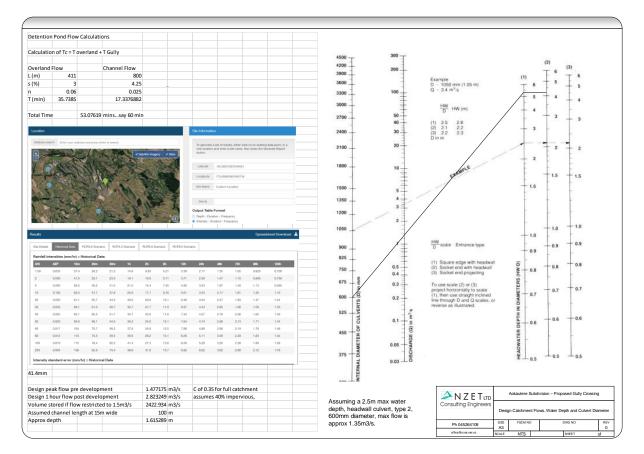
DESIGN FLOWS AND CULVERT SIZING
